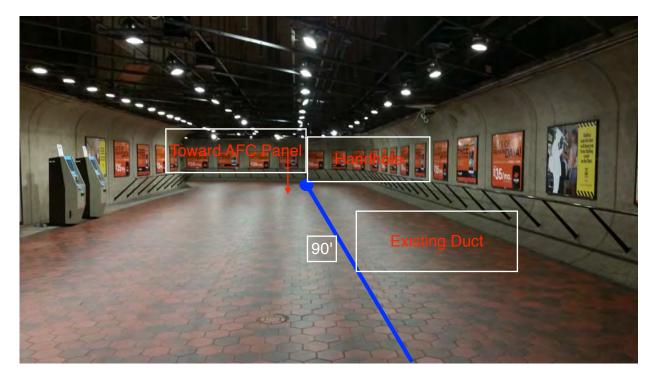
Proposed conduit options at platform level (Option 1 and Option 2 are the same at this location.
